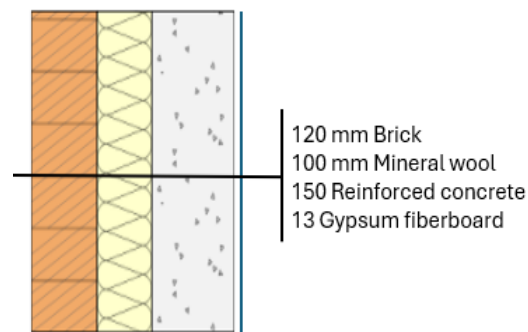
Details of existing exterior concrete wall (Laven and Strandberg, 2019, Cecilia Björk, 2021)
